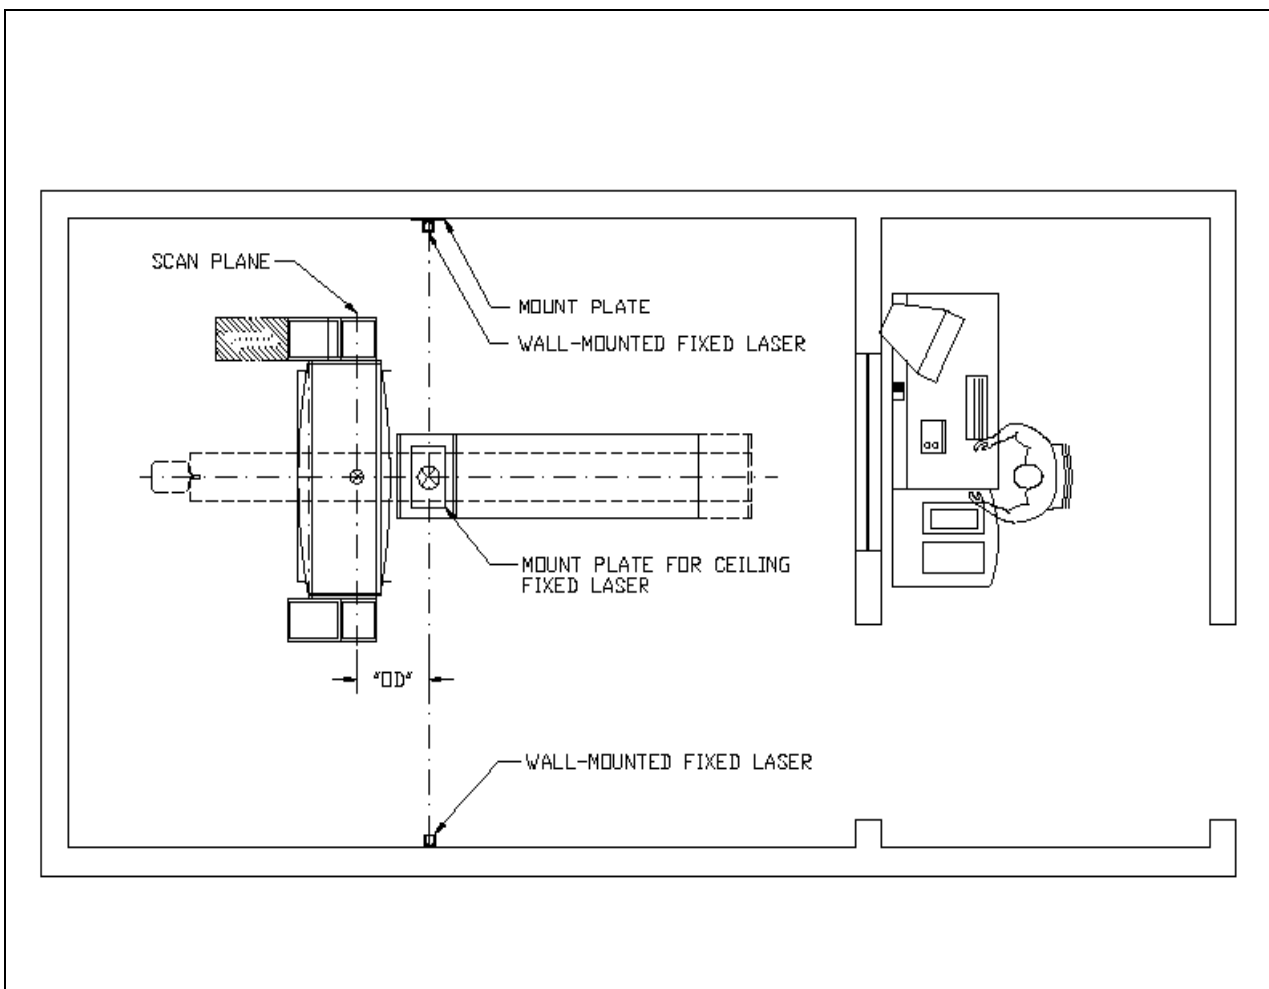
Wall and ceiling-mounted lasers on parallel walls
